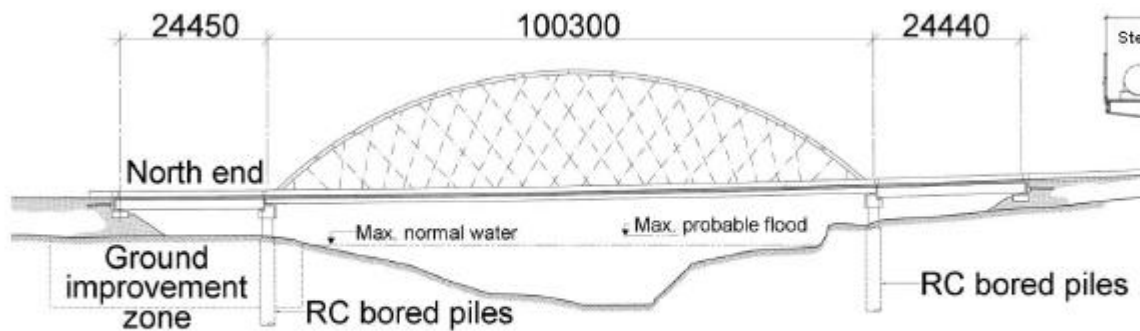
Waikato River Network Arch. Span 100 m. Built 2010. Opened 2011.
